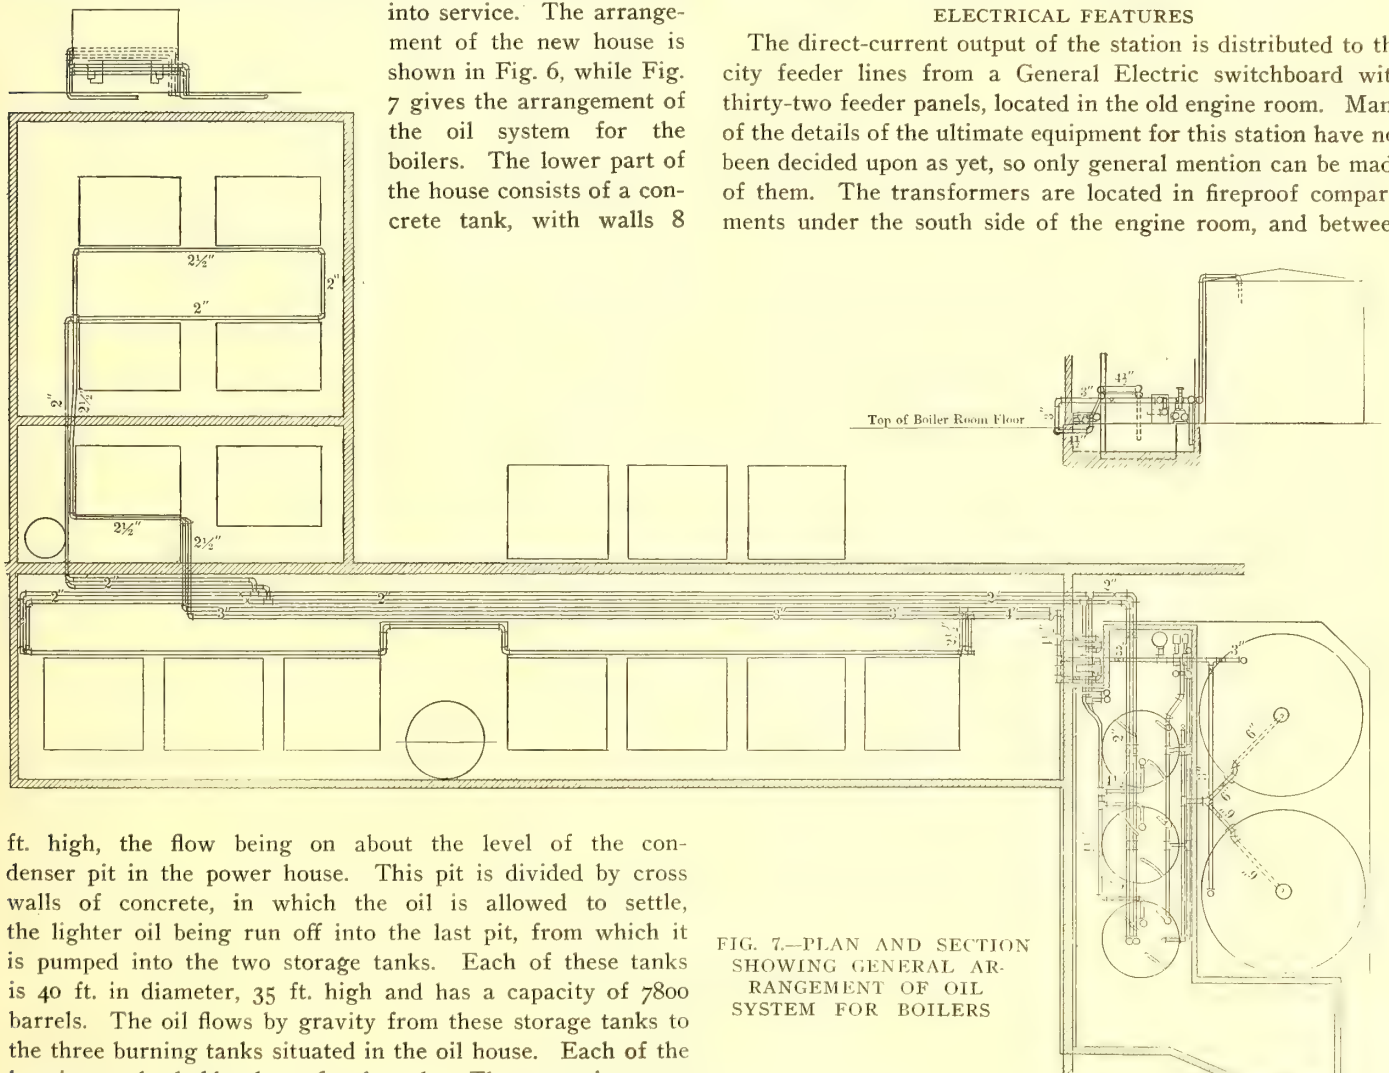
PLAN AND SECTION SHOWING GENERAL ARRANGEMENT OF OIL SYSTEM FOR BOILERS
